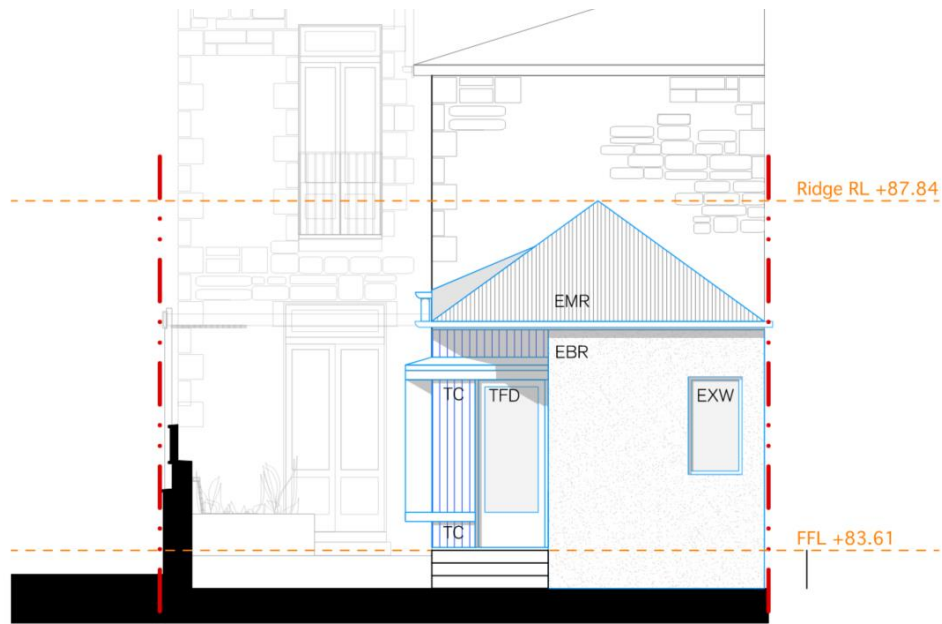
Proposed western elevation - 2 Bishops Avenue, Randwick (Source: McGregor Westlake Architecture)
